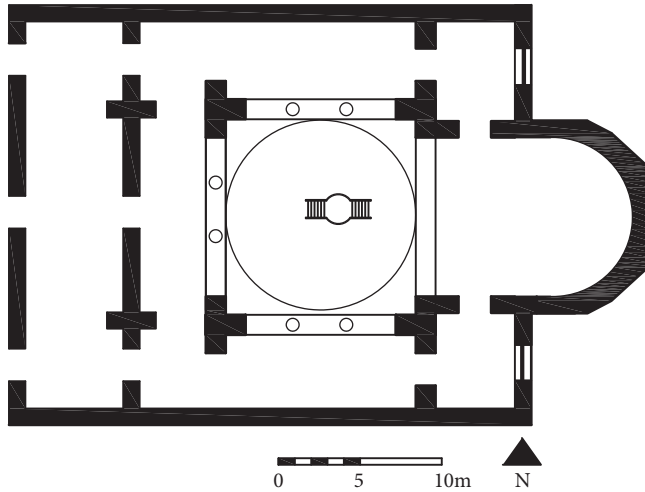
Hypothetical reconstruction of the plan of the cathedral
